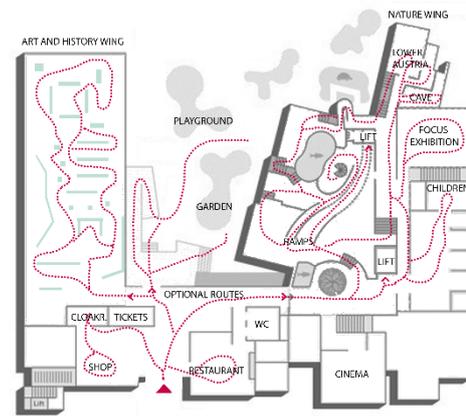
Lower Austria Museum in St. Pölten: Ground floor. (Source: Floor plan by Niederösterreich Museum Betriebs GmbH with Markings by Filová, 2021)
